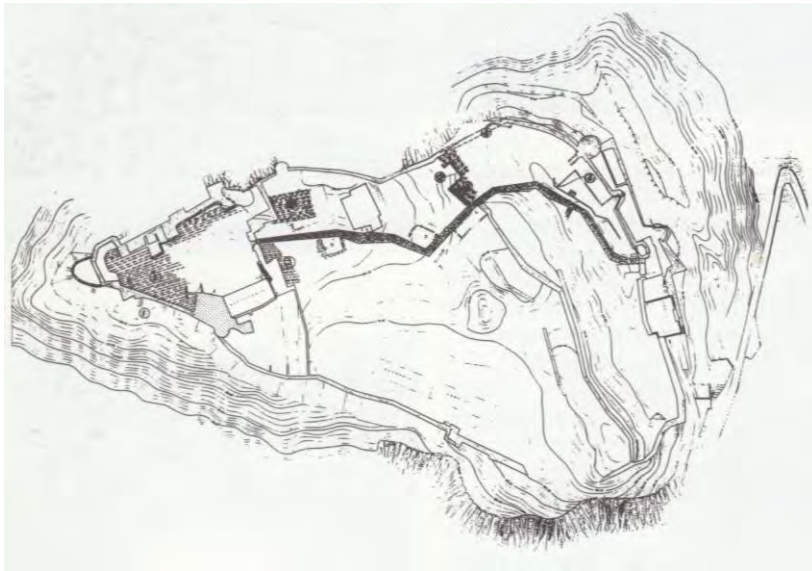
Plan of Shkodra Fortress<sup>122</sup>
